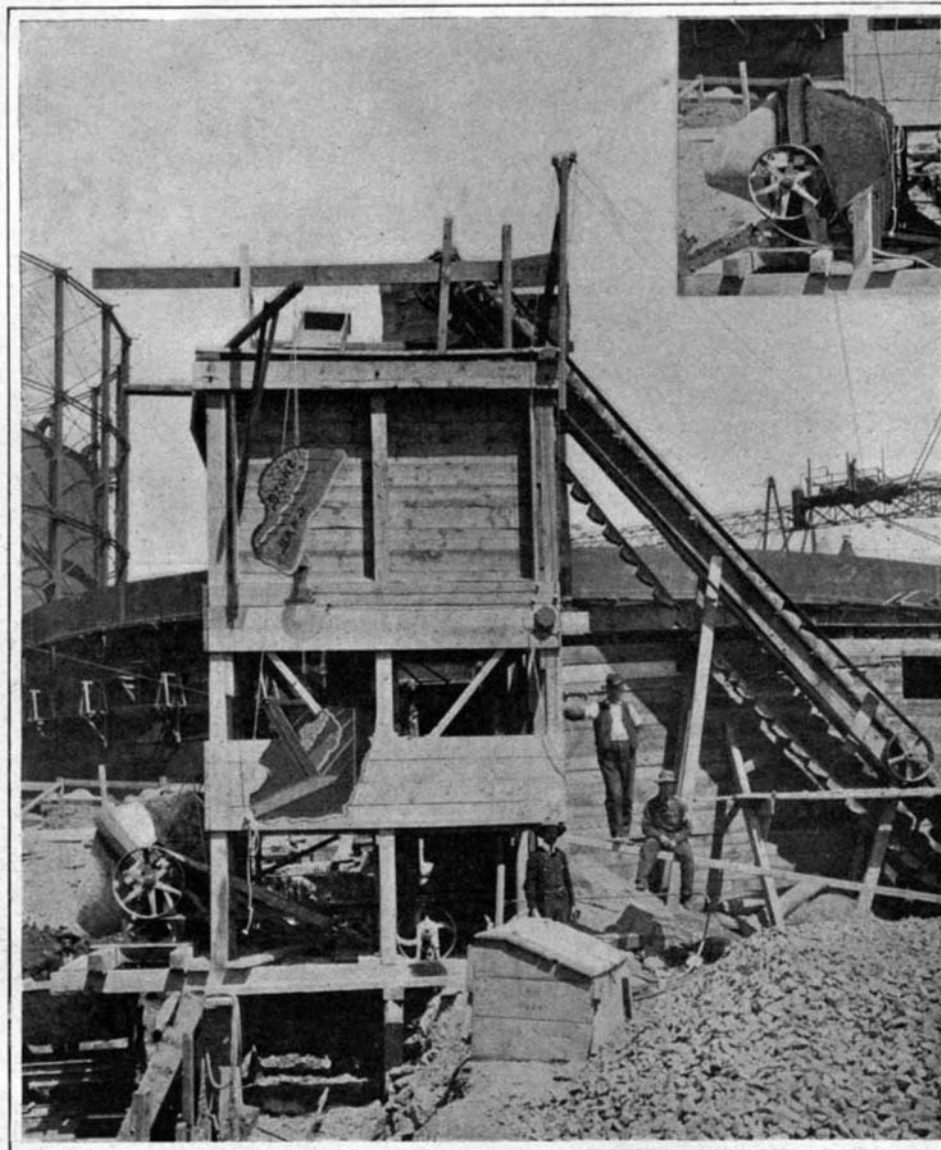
A Concrete Mixing Plant—Smith Mixer in Discharge Position.
